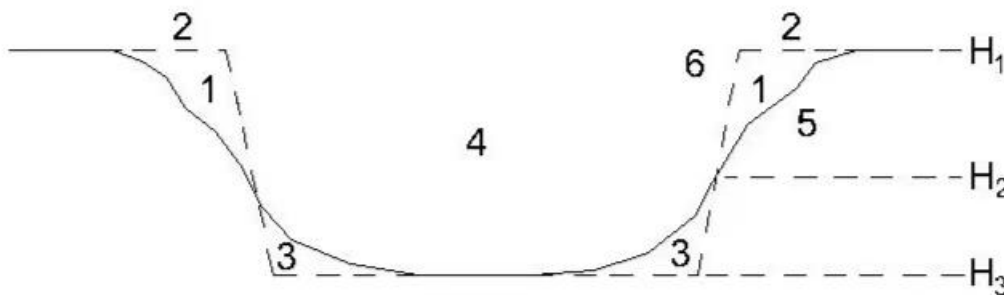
Schematic diagram of the shallow layout of the excavation pad
